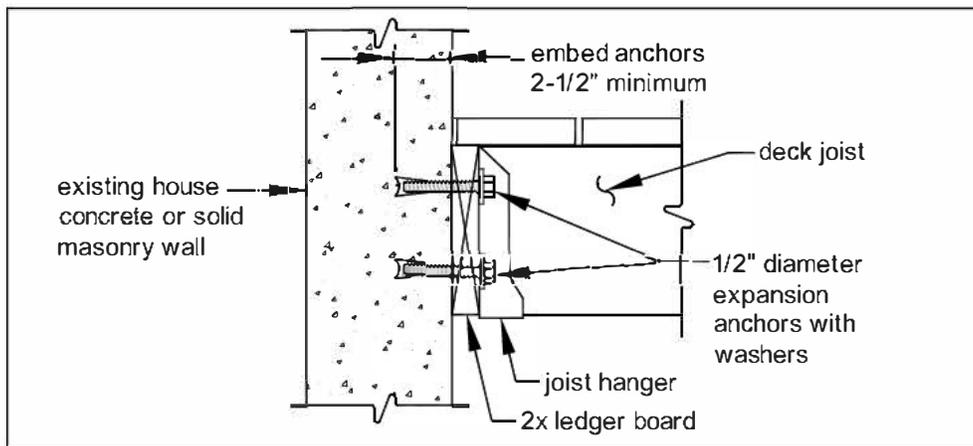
ATTACHMENT OF LEDGER BOARD-TO-FOUNDATION WALL (CONCRETE OR SOLID MASONRY)
